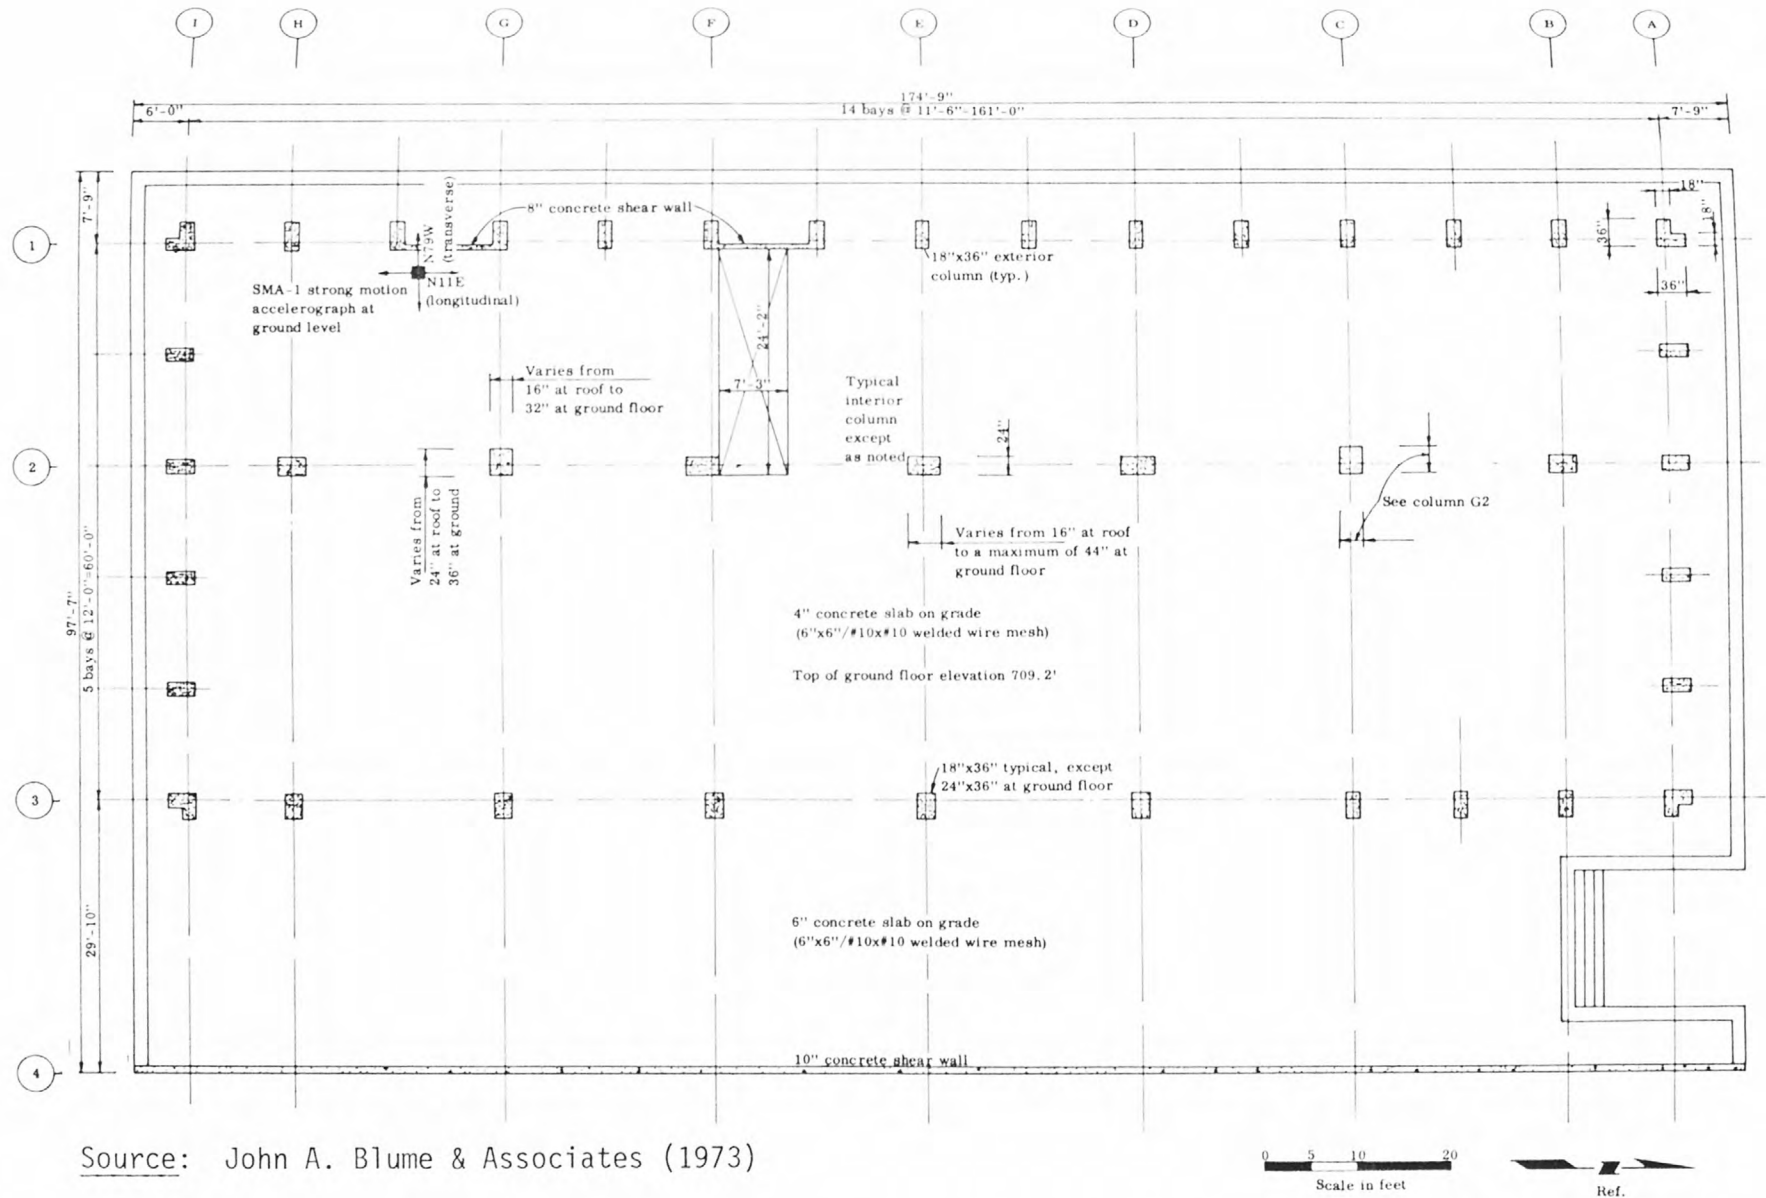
BANK OF CALIFORNIA BUILDING: GROUND-FLOOR PLAN
